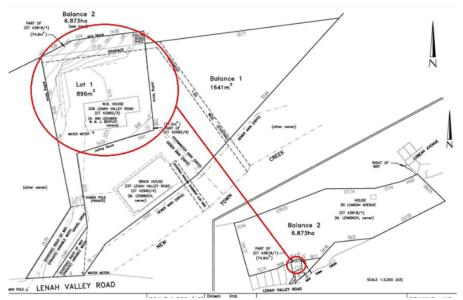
Applicant Site plan (John Bamford and Assocs Surveyors, 2021)
